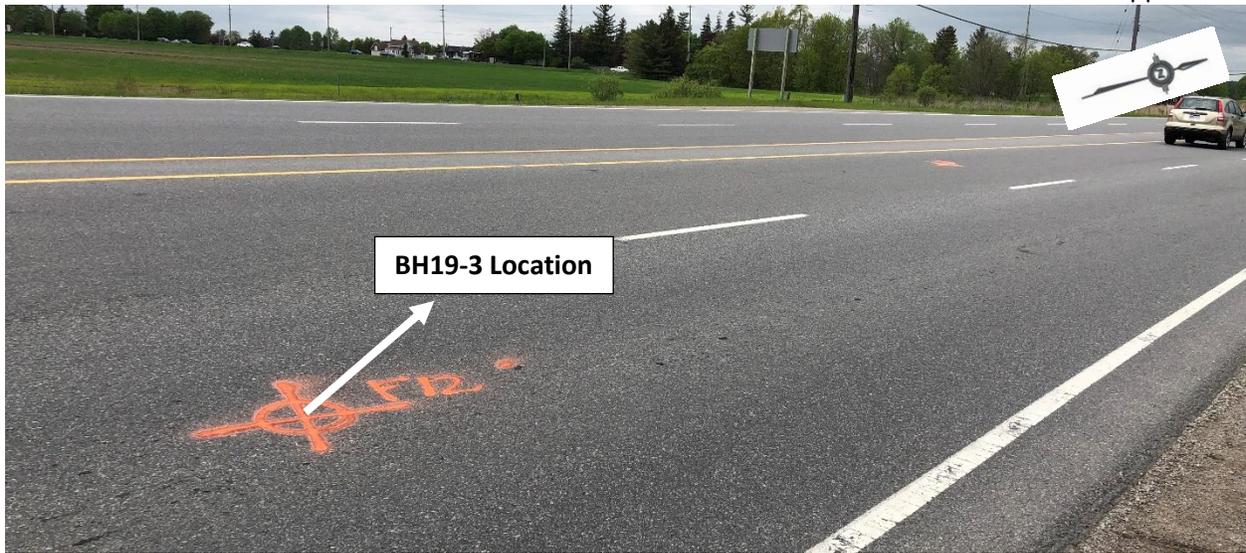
Looking towards North near culvert Sta. 24+114 (June 2019)
